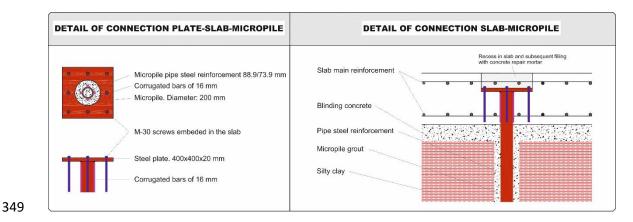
Detail of the connection between the existing foundation and the embedded micropiles.
